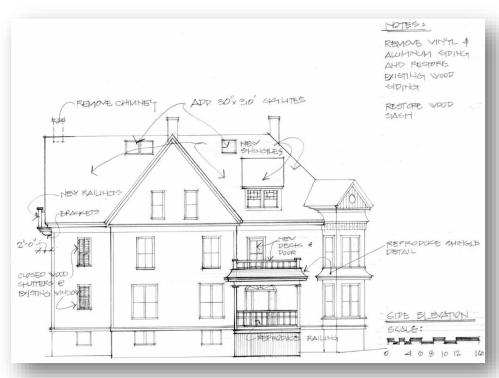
Proposed Exterior Alterations to Left Side Elevation (Garden Street)
